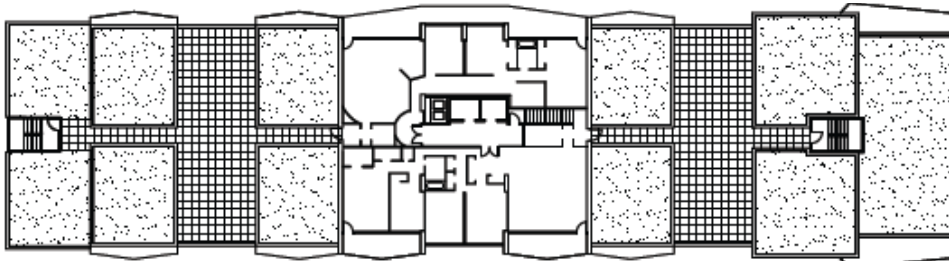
Roof Plan (Kesik & Saleff, 2009)
